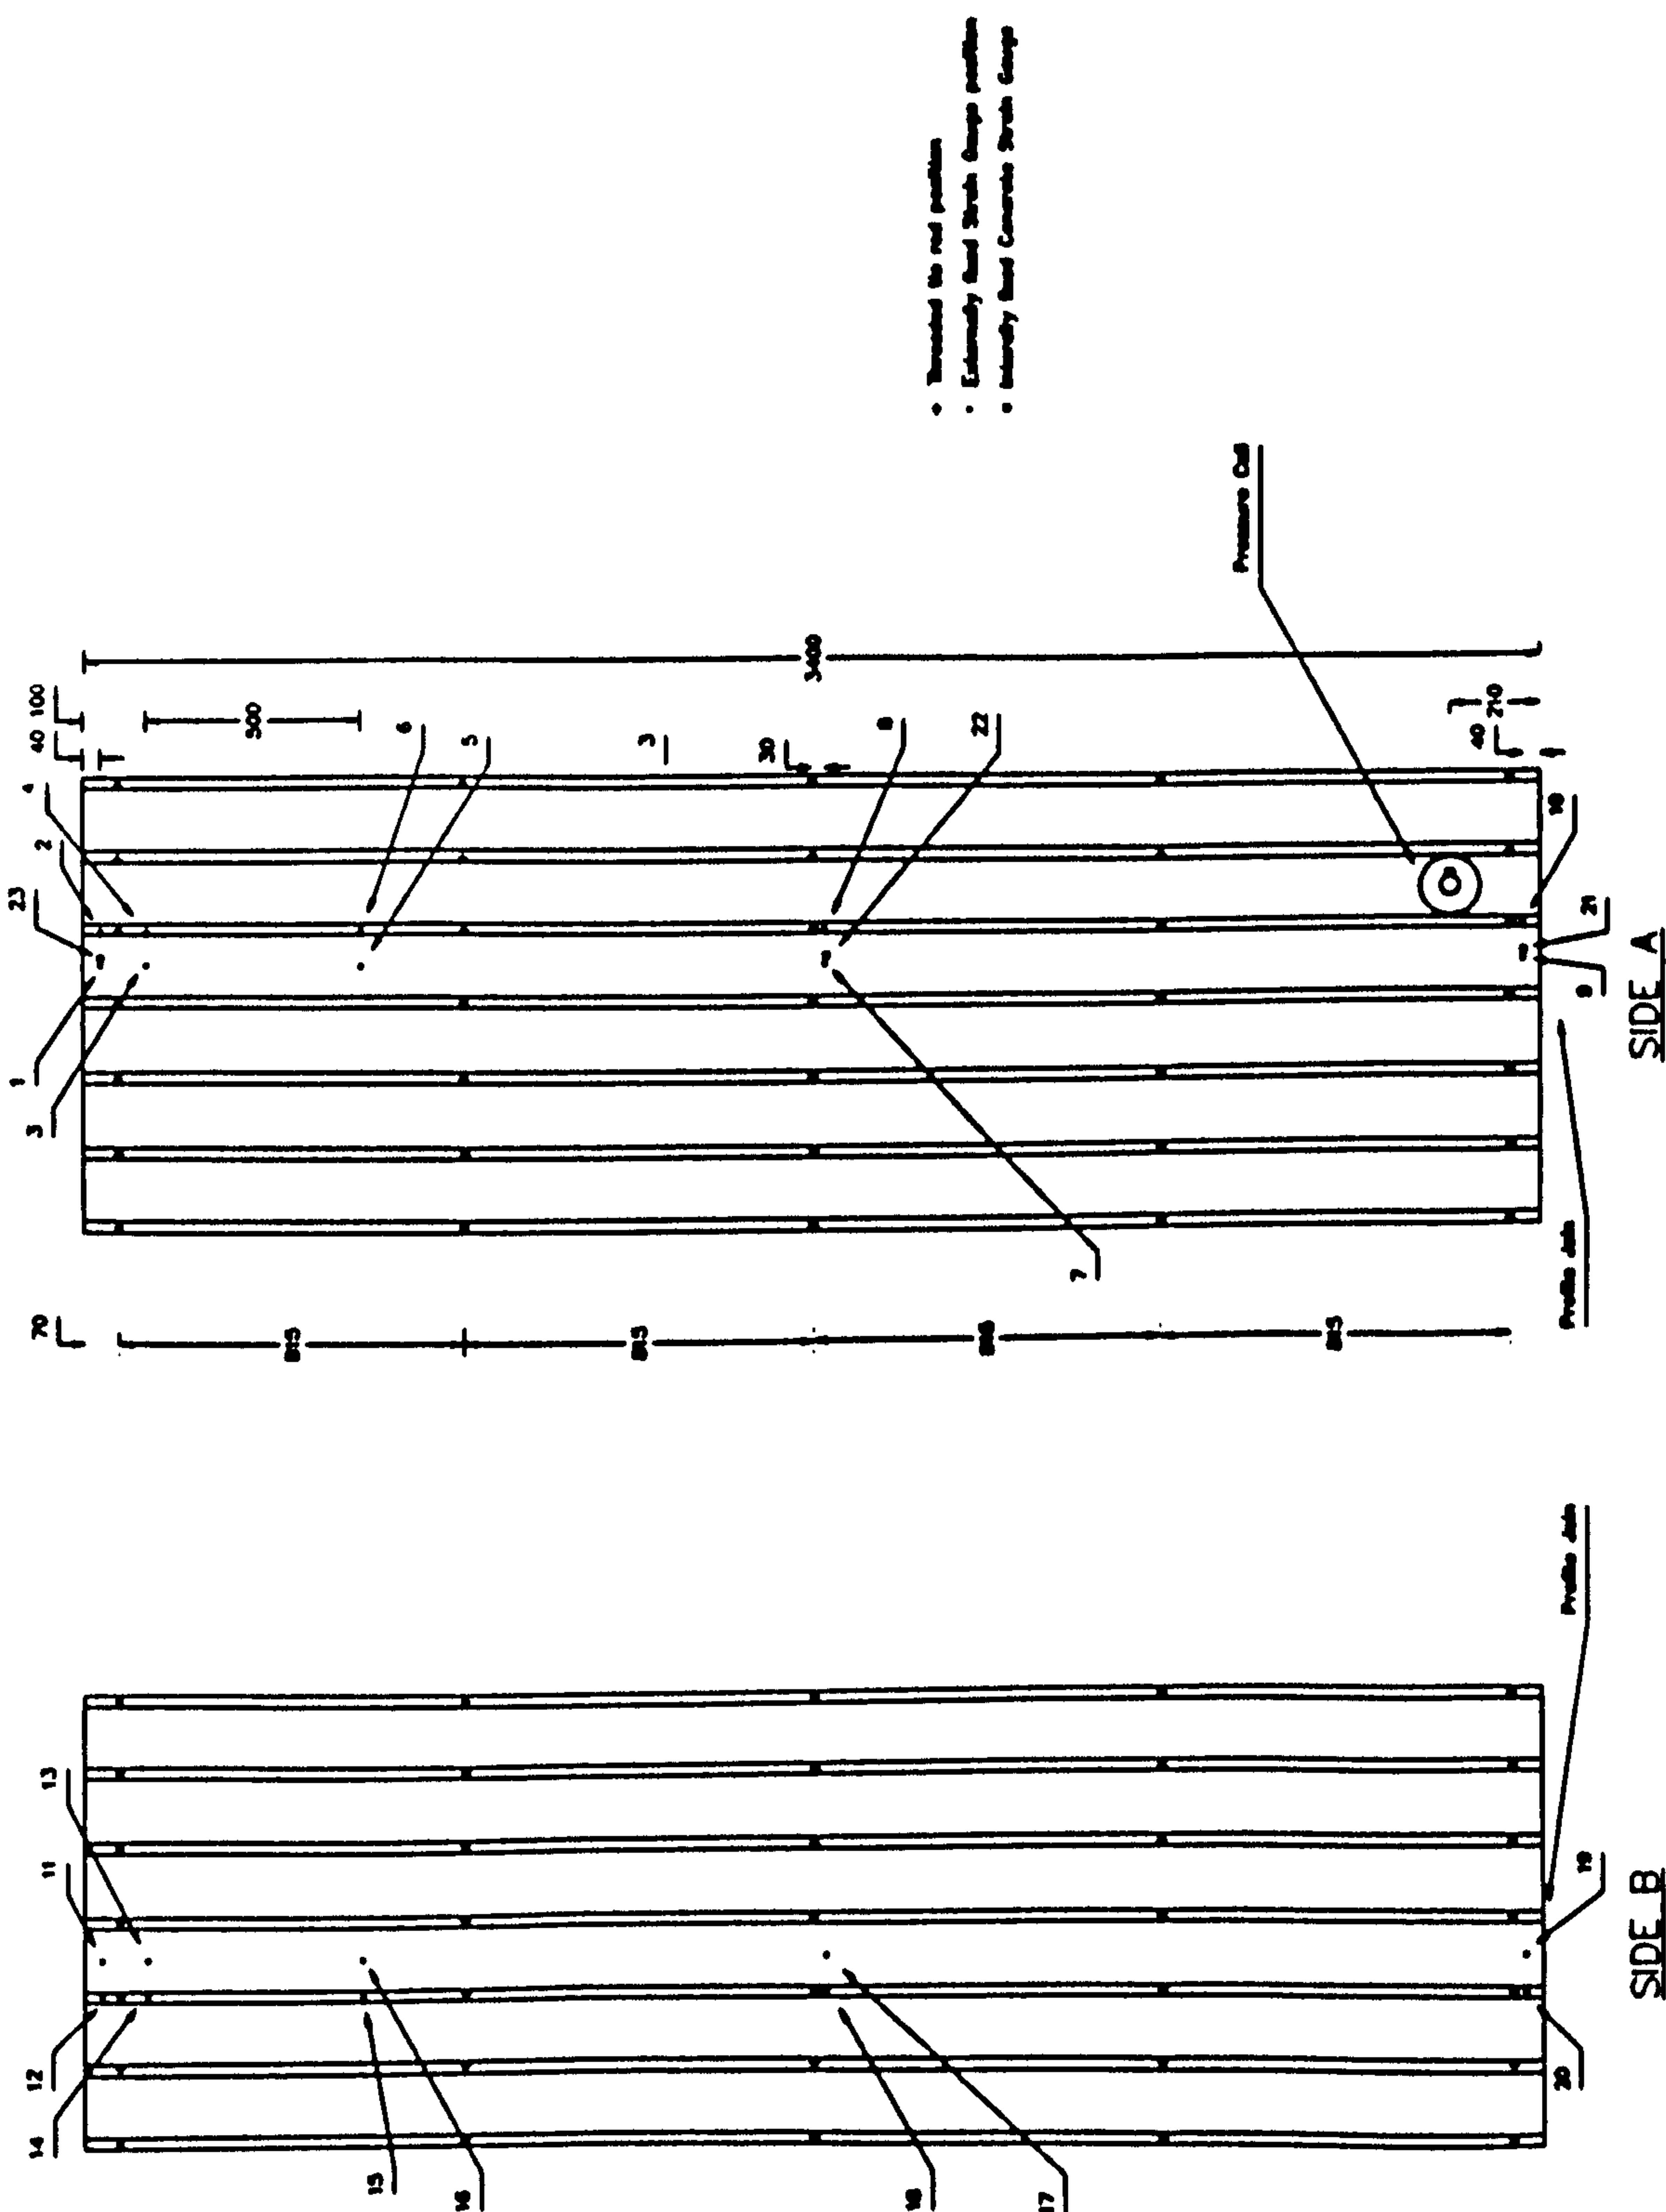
Wall 3 : Dimensions and Instrumentation
